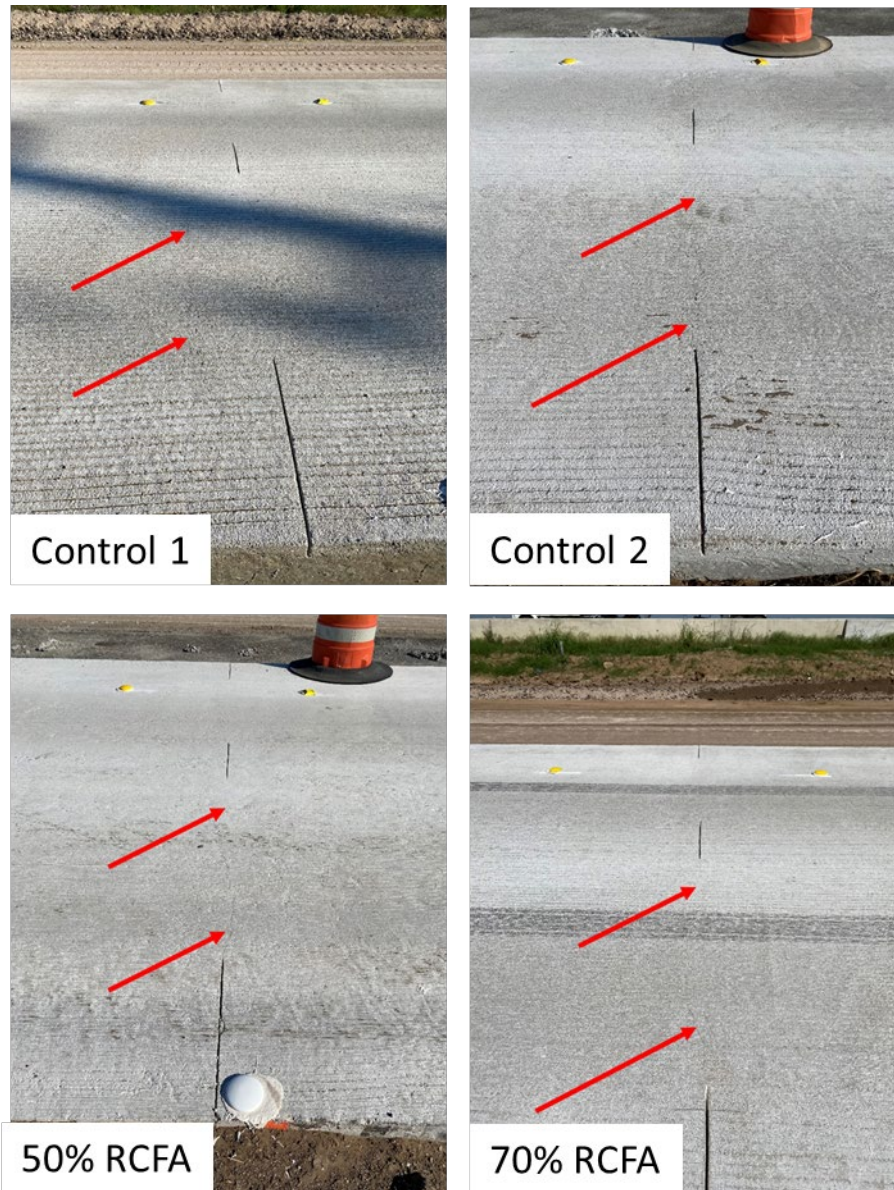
Cracking at pre-cut, partial jointed sections nine days after paving
